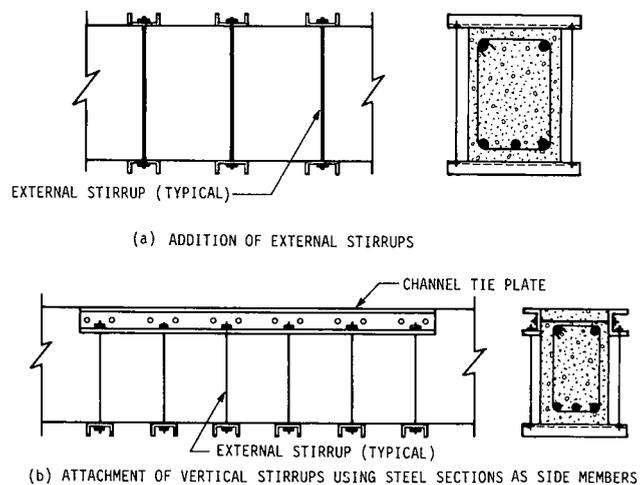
Methods of adding external shear reinforcement to reinforced concrete beams.
